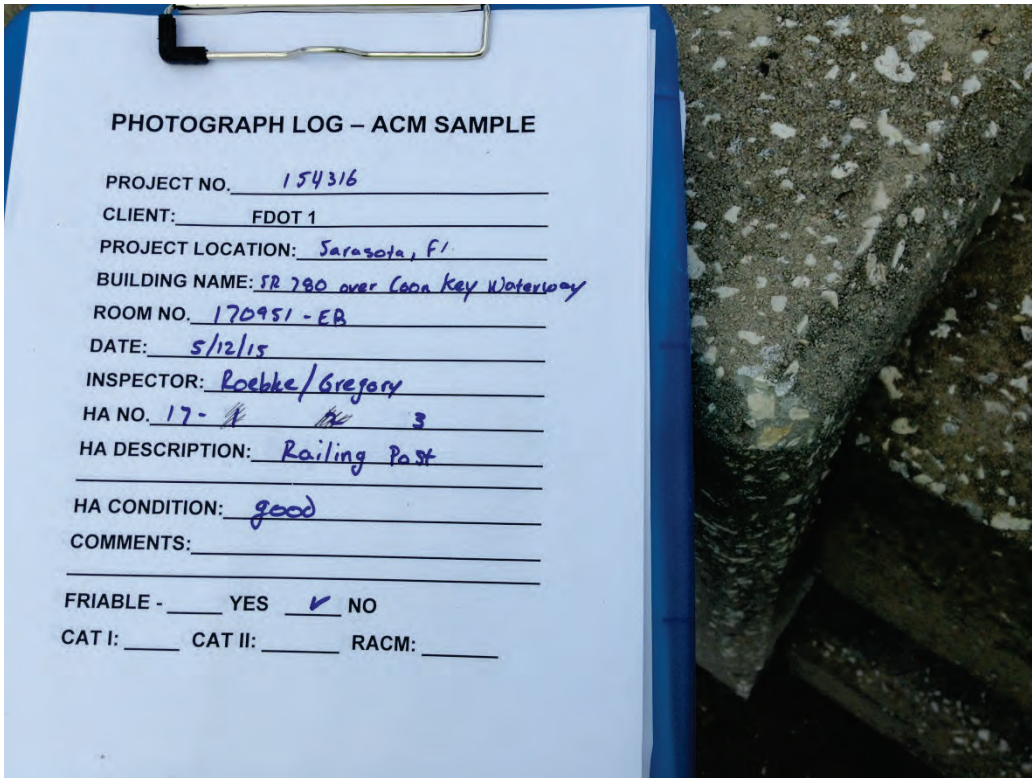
5/12/15 – SAMPLE 17.3 – HA 17
